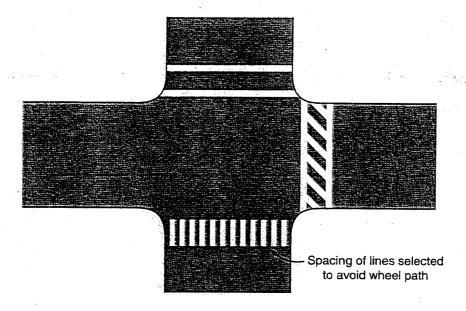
B-16. Typical Crosswalk Markings for Exclusive Pedestrian
